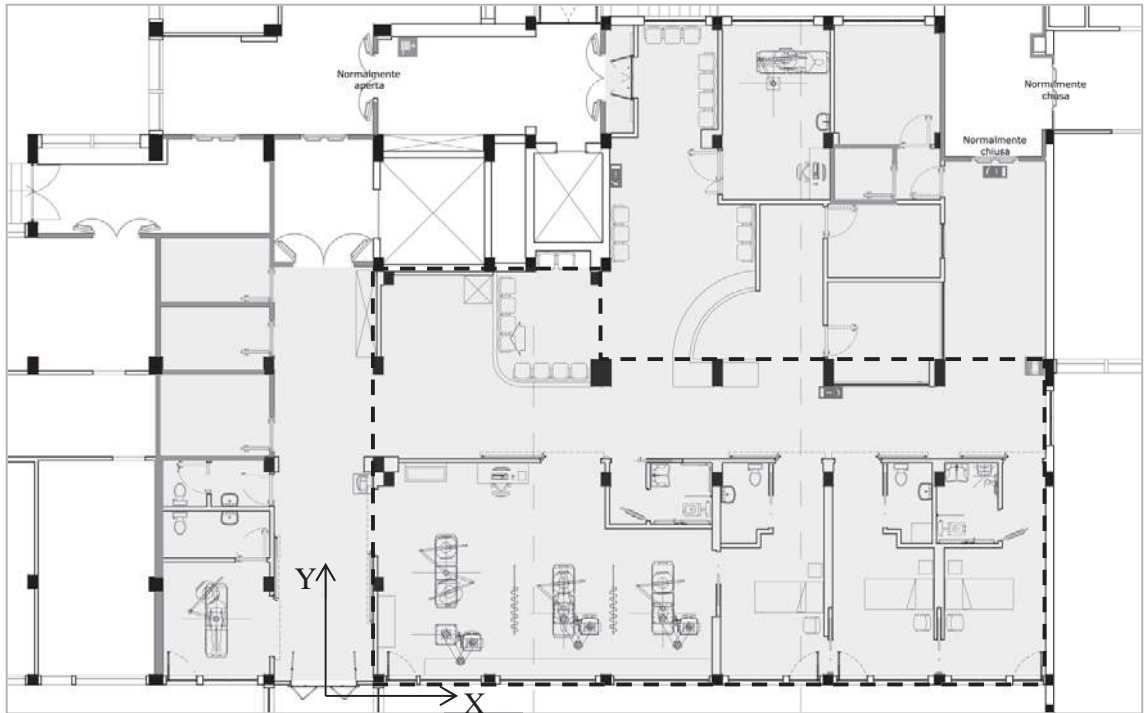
5 Architectural plan extracted from the hospital (in shadow the Emergency Department).
